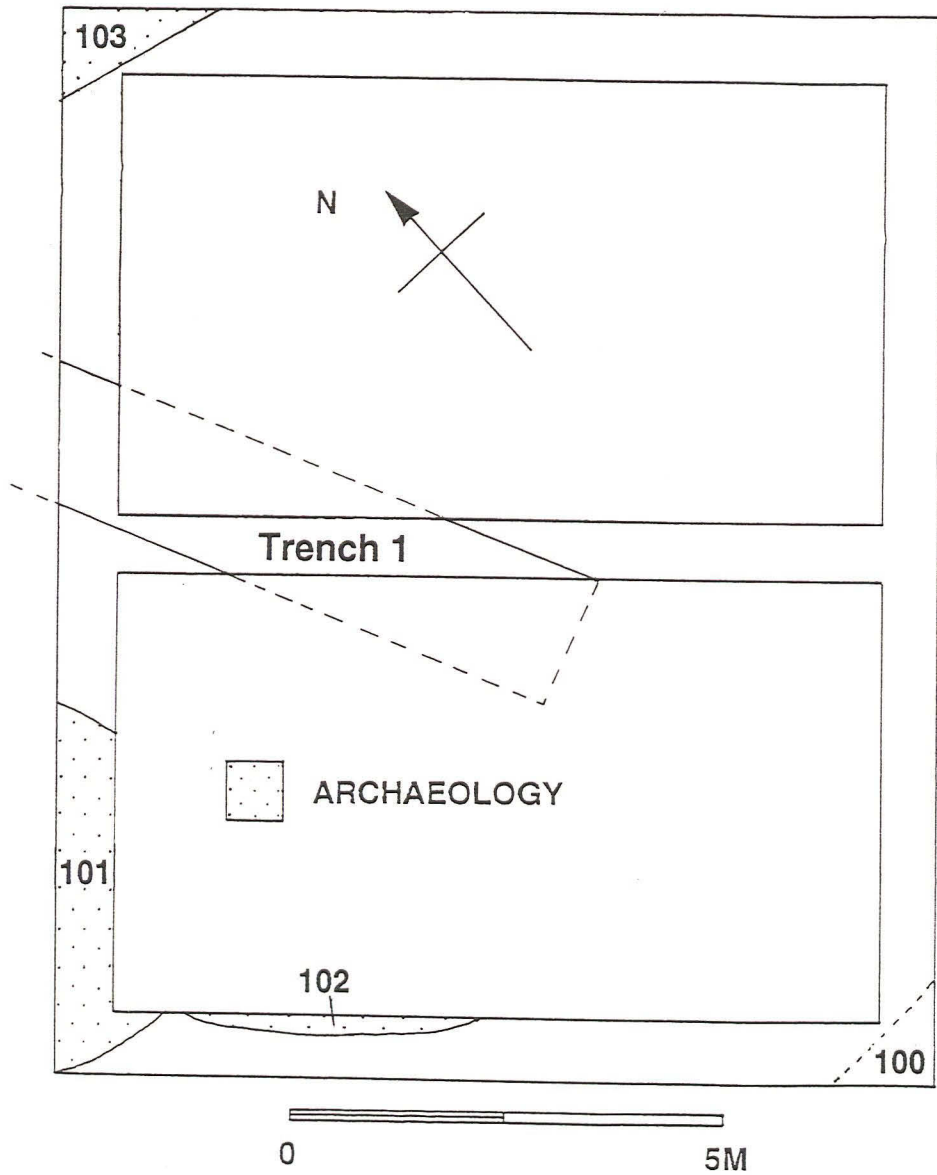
Plan of the features revealed in foundation trenches for house plots 9 and 10 (McDaid after Field, based on Ground Floor Plan by R. Lowe dwg. no. 9452.05).
